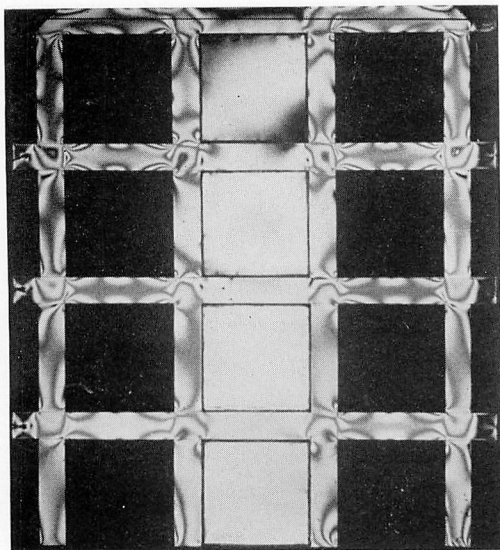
a Isochromatics of Frame with four Wall Panels Subjected to Lateral Forces on Roof Beams
